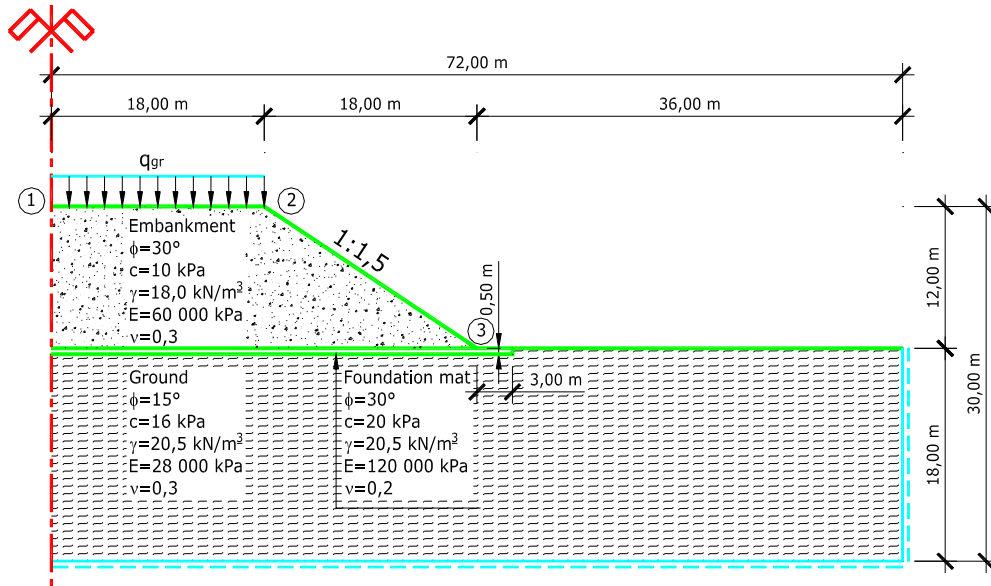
The static model of the embankment, adopting the subgrade reinforcement of a cushion
